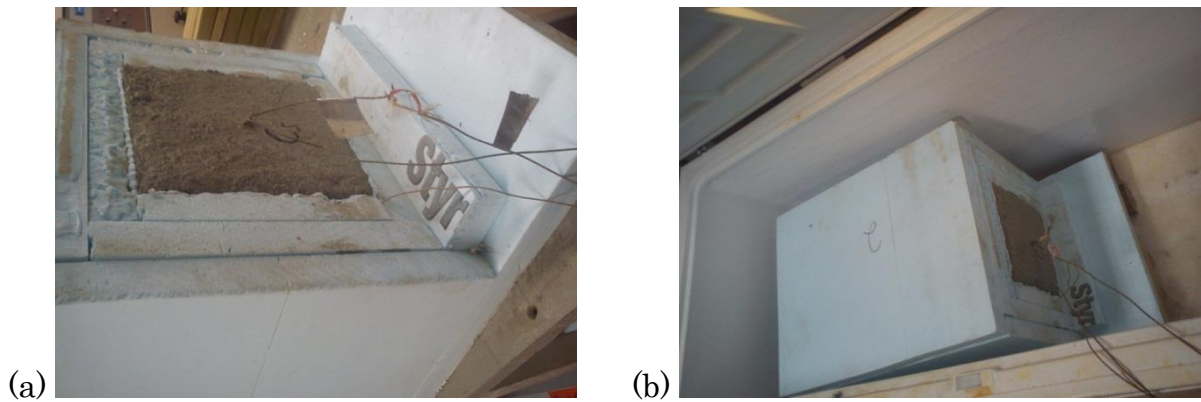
Experimental Test; a: Sandwich wall panel inside the insulation box, b: Sandwich wall panel inside the freezer
